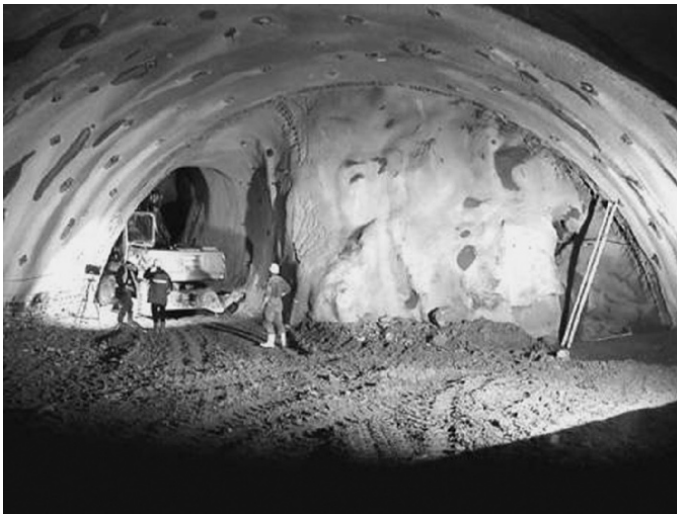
Karst cave, Irlahüll Tunnel (source: site photo BÜZ Mitte).
